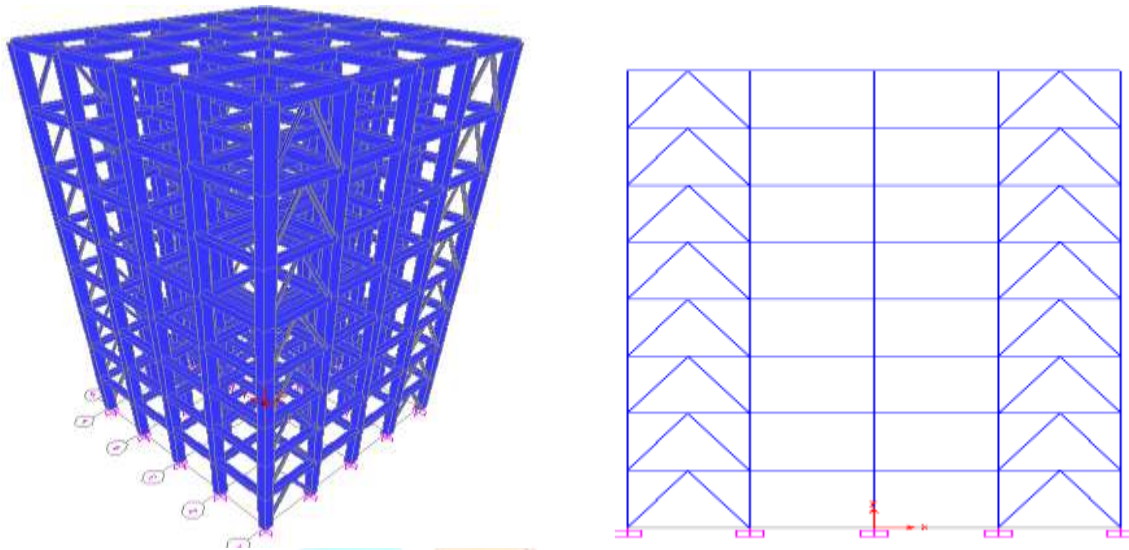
3-D and Elevation View of Inverted V (Chevron) Braced Frame Structure
